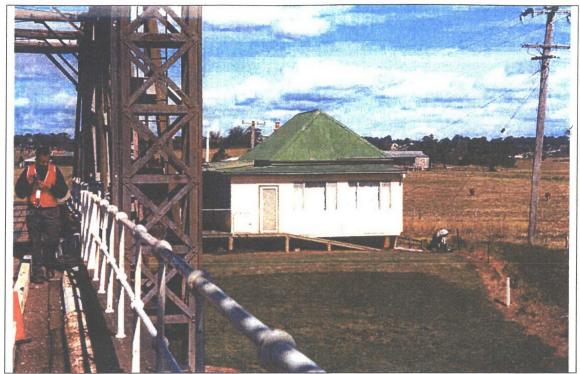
Bridge operators cottage to the immediate south west of Dunmore Bridge.
